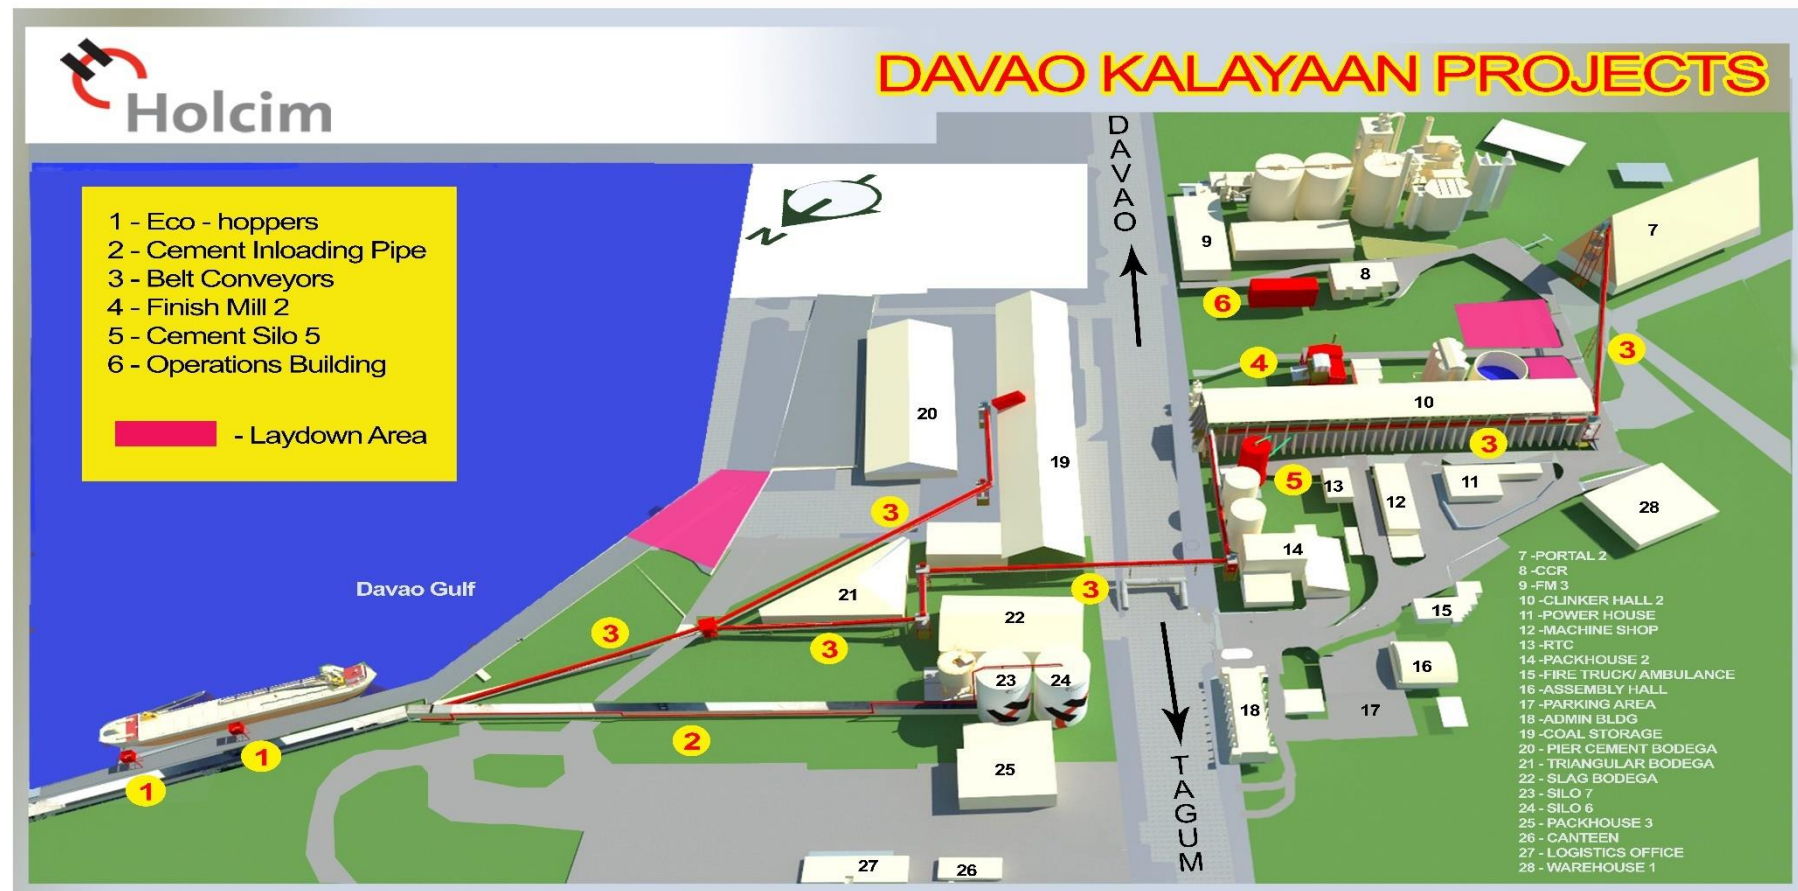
Illustration of Holcim Davao Plant General Layout with the proposed modification
